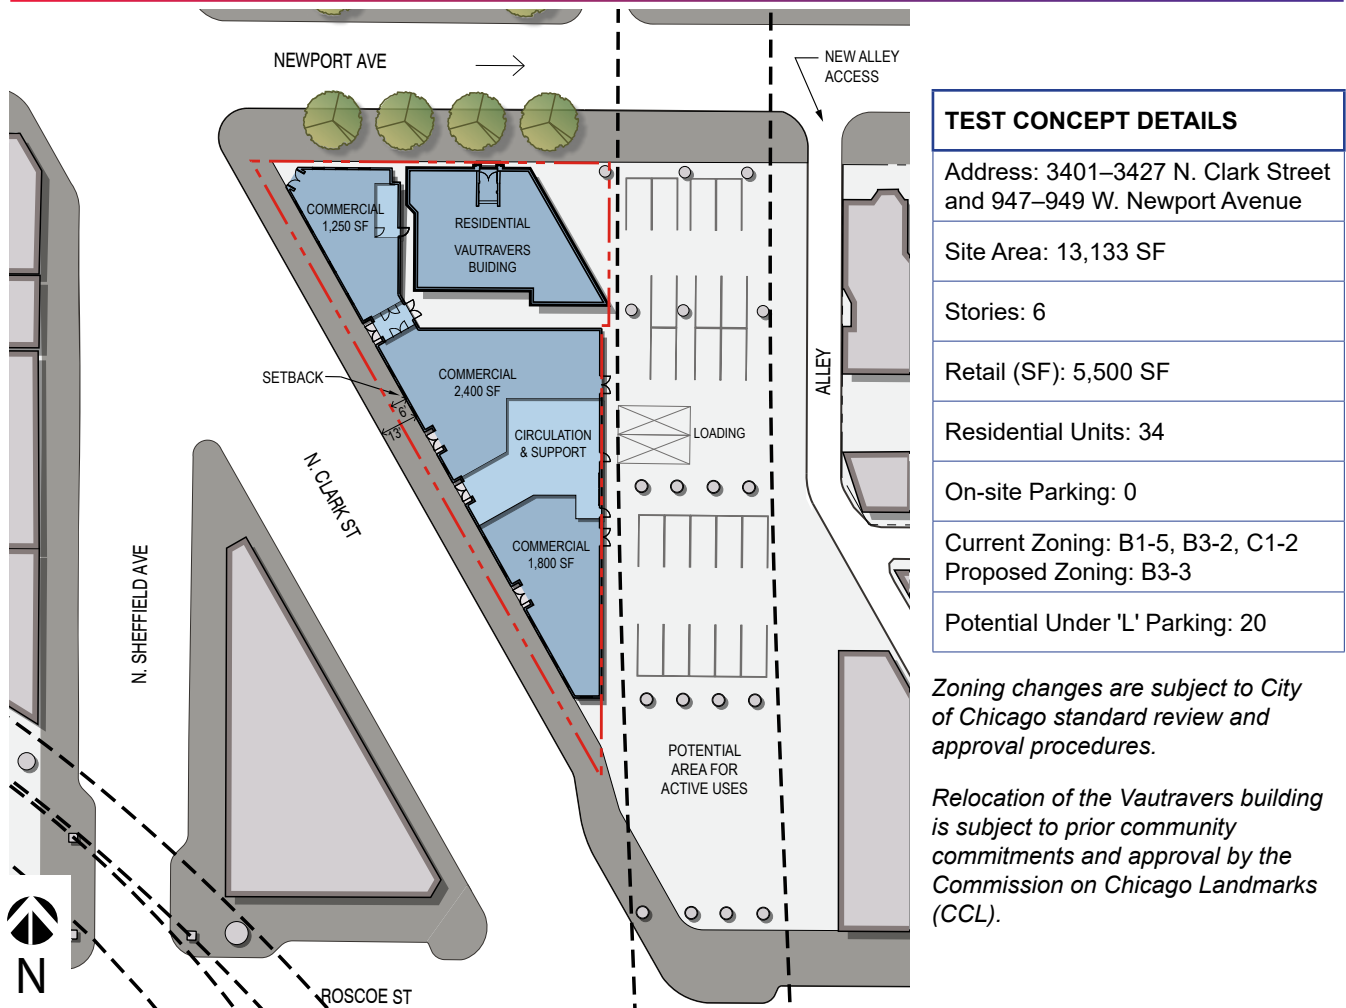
Clark Street and Newport Avenue test concept site plan
